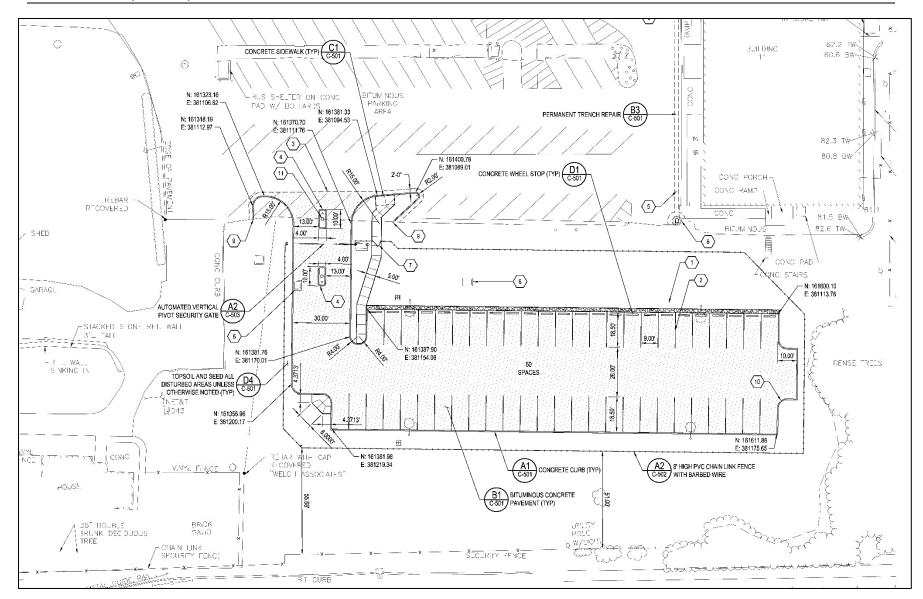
Building 11 Parking Area (Proposed Action and Action Alternative)
